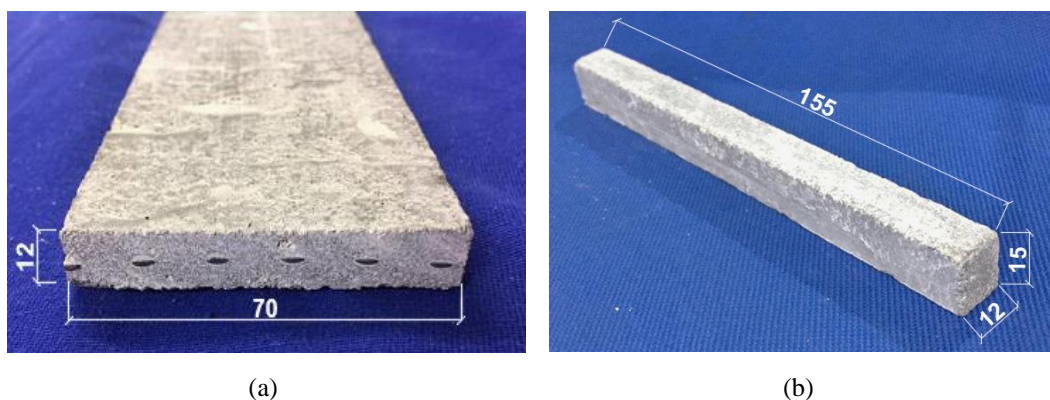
Test specimens and their dimensions: (a) rectangular column; (b) CLC specimen.
